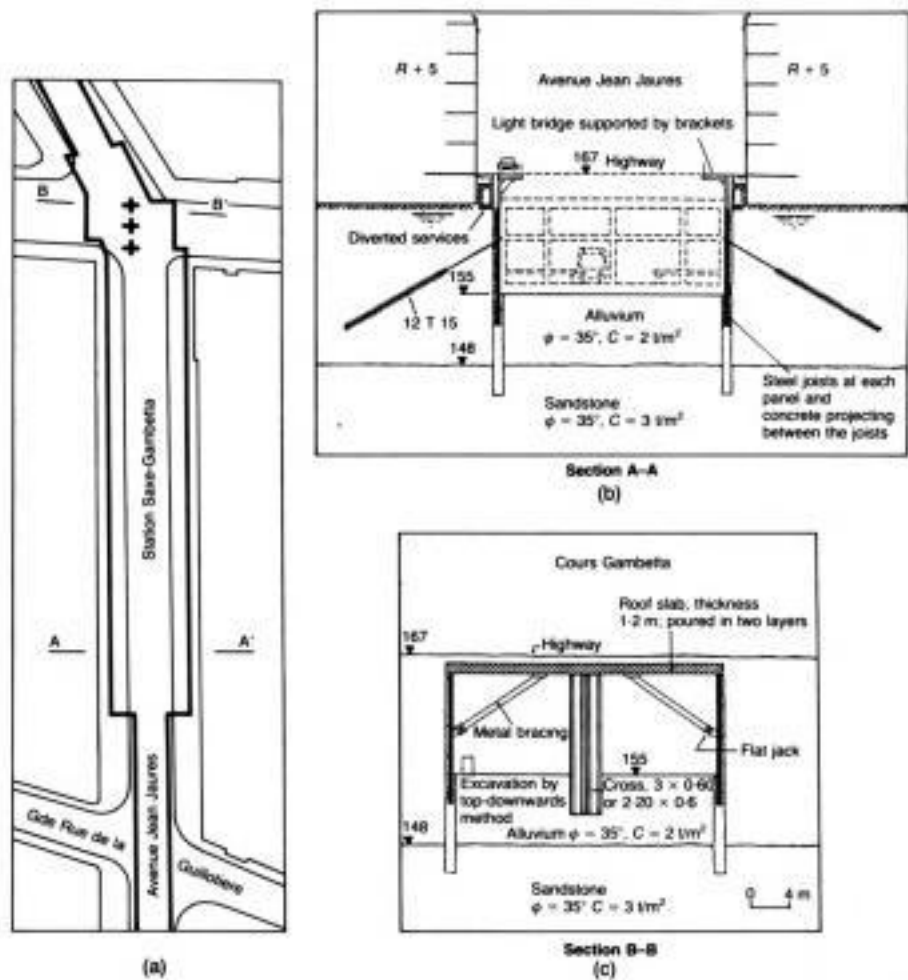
Lyons Metro, Saxe-Gambetta station: (a) plan of site area; (b) section A-A, works in open trench; (c) section B-B, at junction, constructed by top-downwards method (courtesy of Soletanche)
